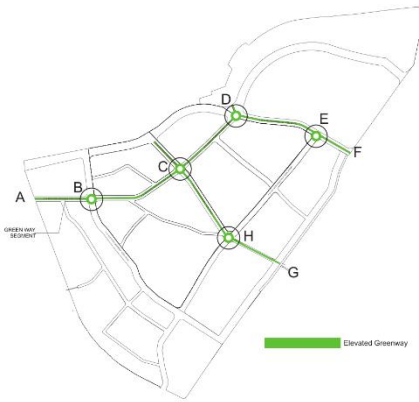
Proposed Elevated Greenway Layout Plan for the DRP
